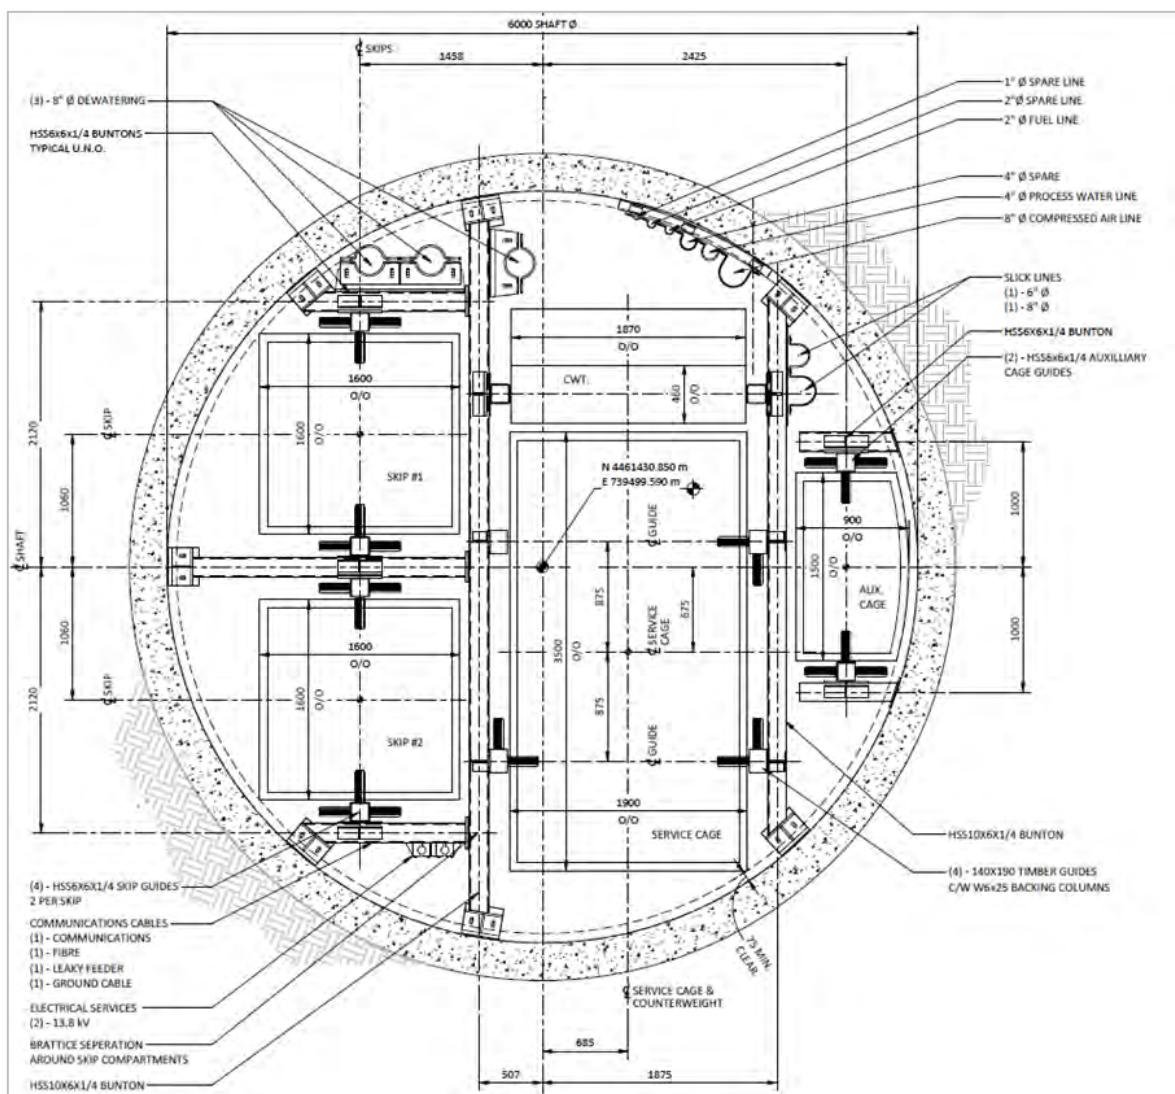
Underground Mine Access Via Twin Concrete Lined Shafts
